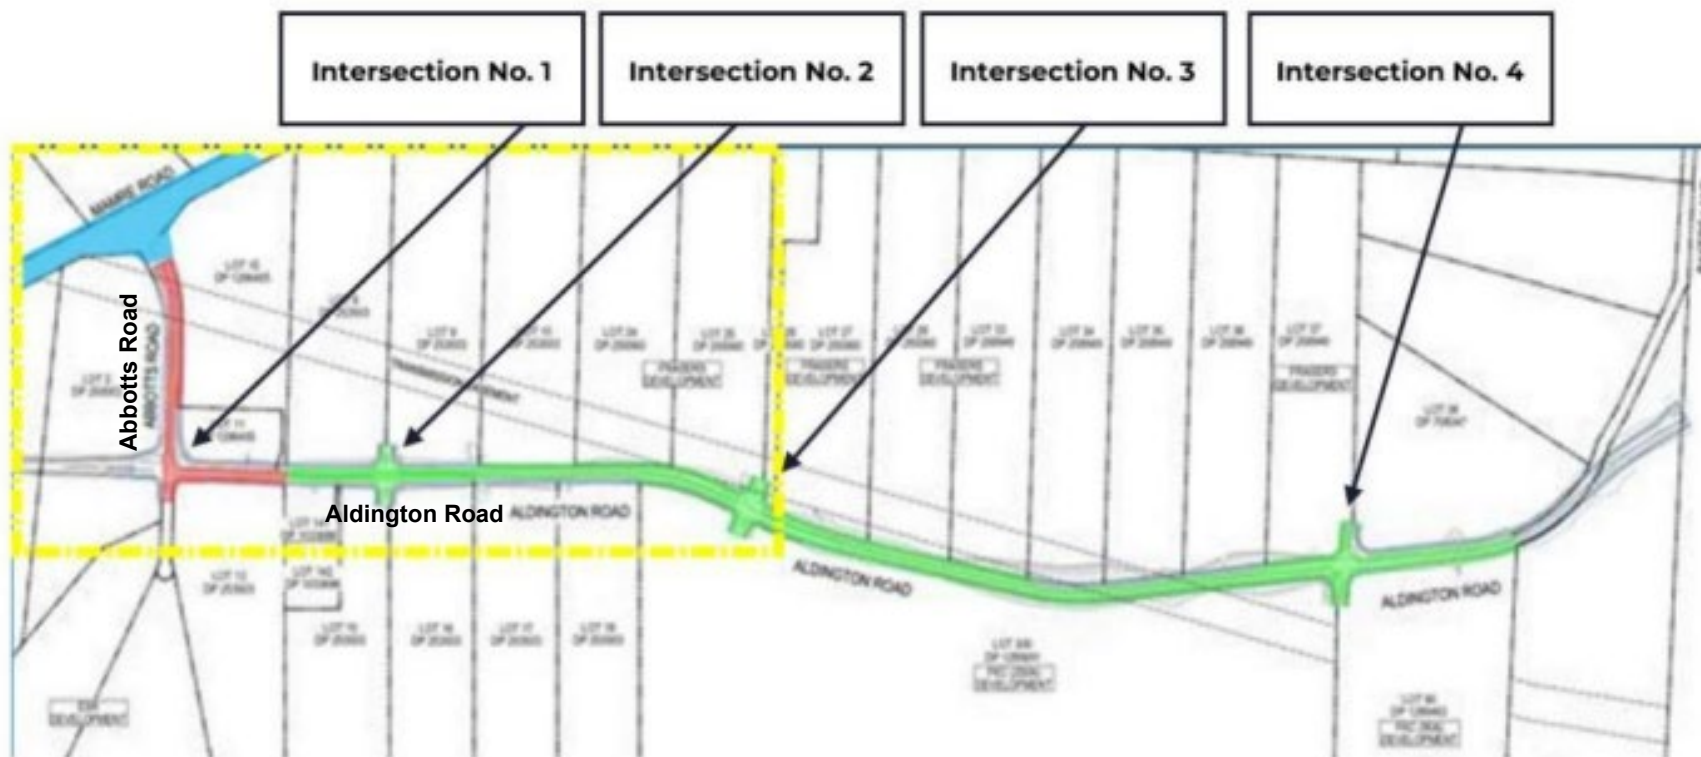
Mamre Road / Abbotts Road Intersection and Aldington Road Upgrades
